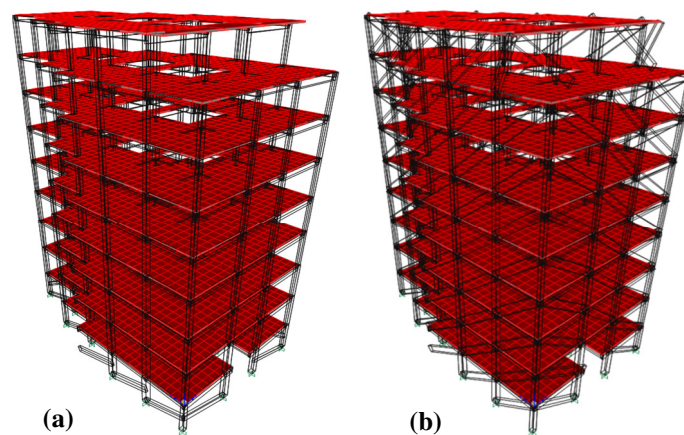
(a) Models A with no masonry infill walls but at the basement of the building; (b) Models B with masonry walls along the height of the building.
